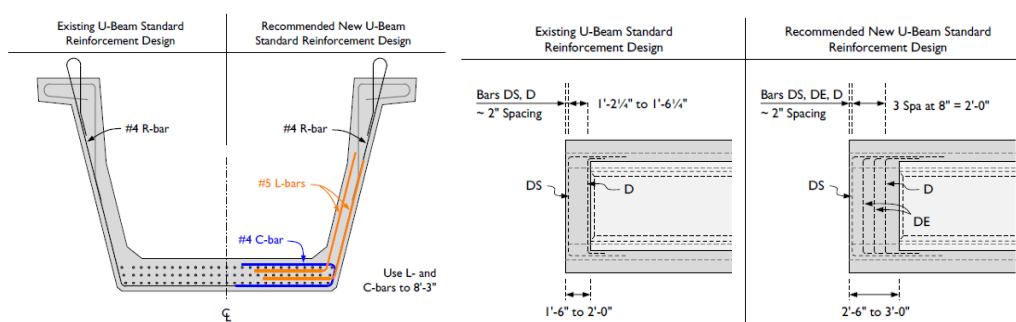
Proposed reinforcing details for tub girders (Hovell et al. 2013)
